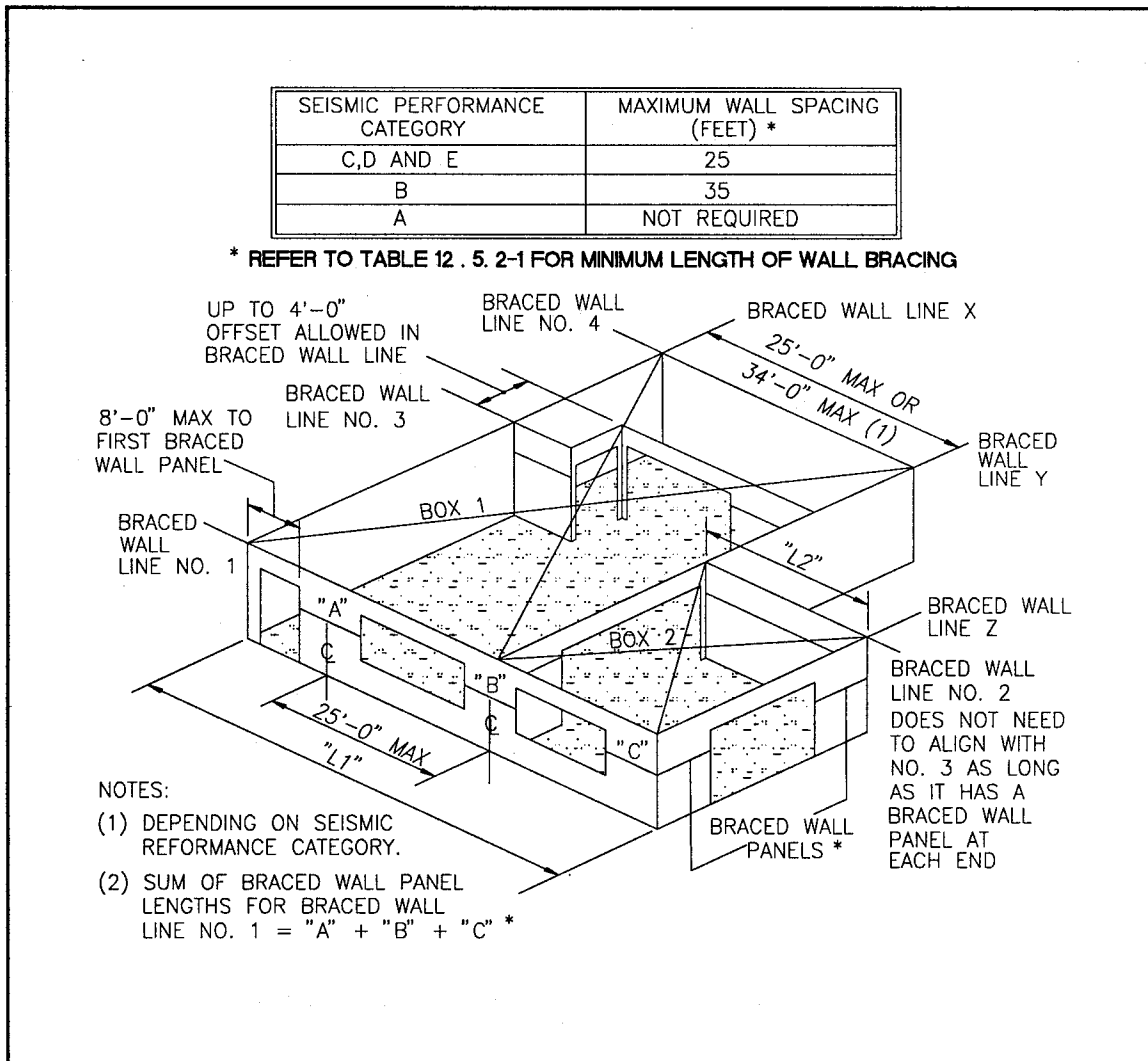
Acceptable one-story bracing example.
